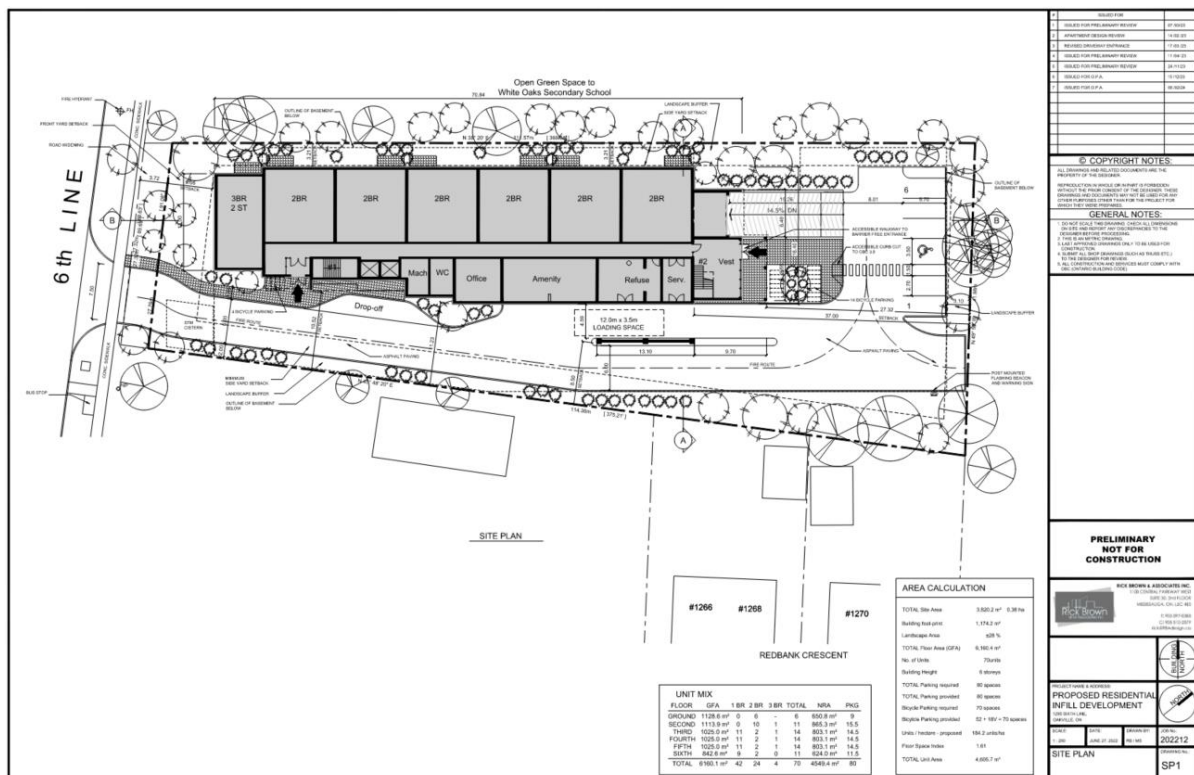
Concept Plan for Apartment, dated June 6, 2024
